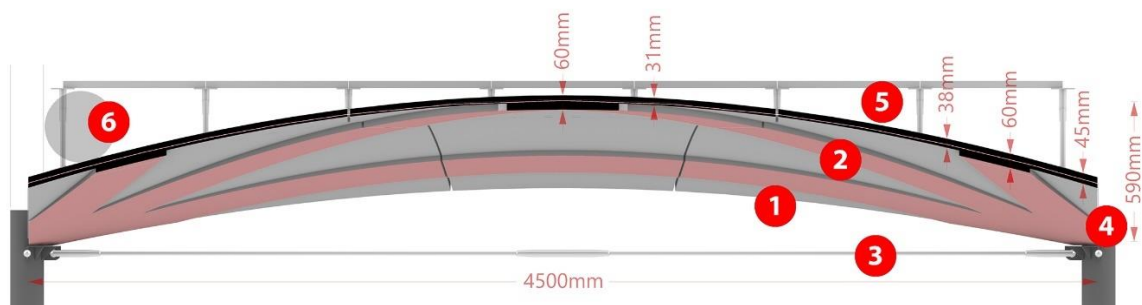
Cross section through shell's apex: 1 - segmented shell; 2 - shell ribs (in red); 3 - tie rods; 4 - column heads; 5 - raised floor; 6 – space for Ø300 mm duct
